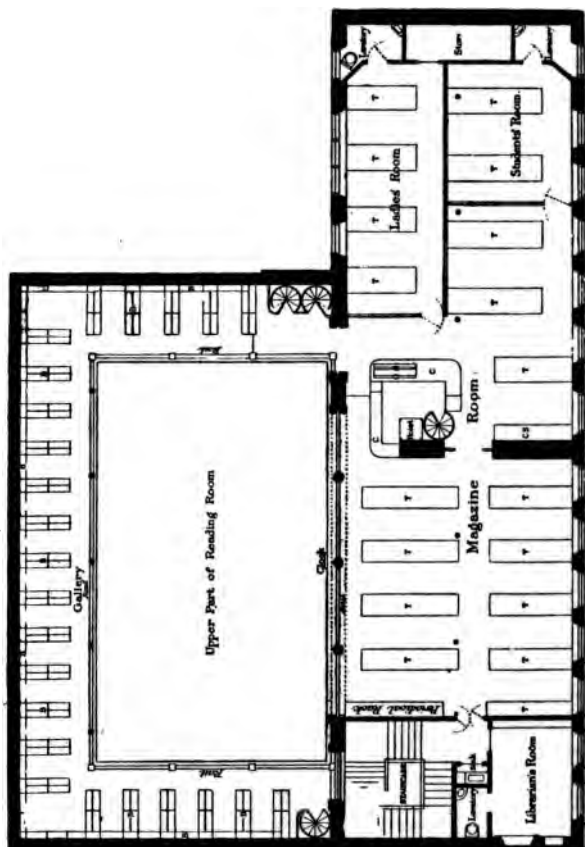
Plan of first floor of the Mitchell Library, Glasgow.
